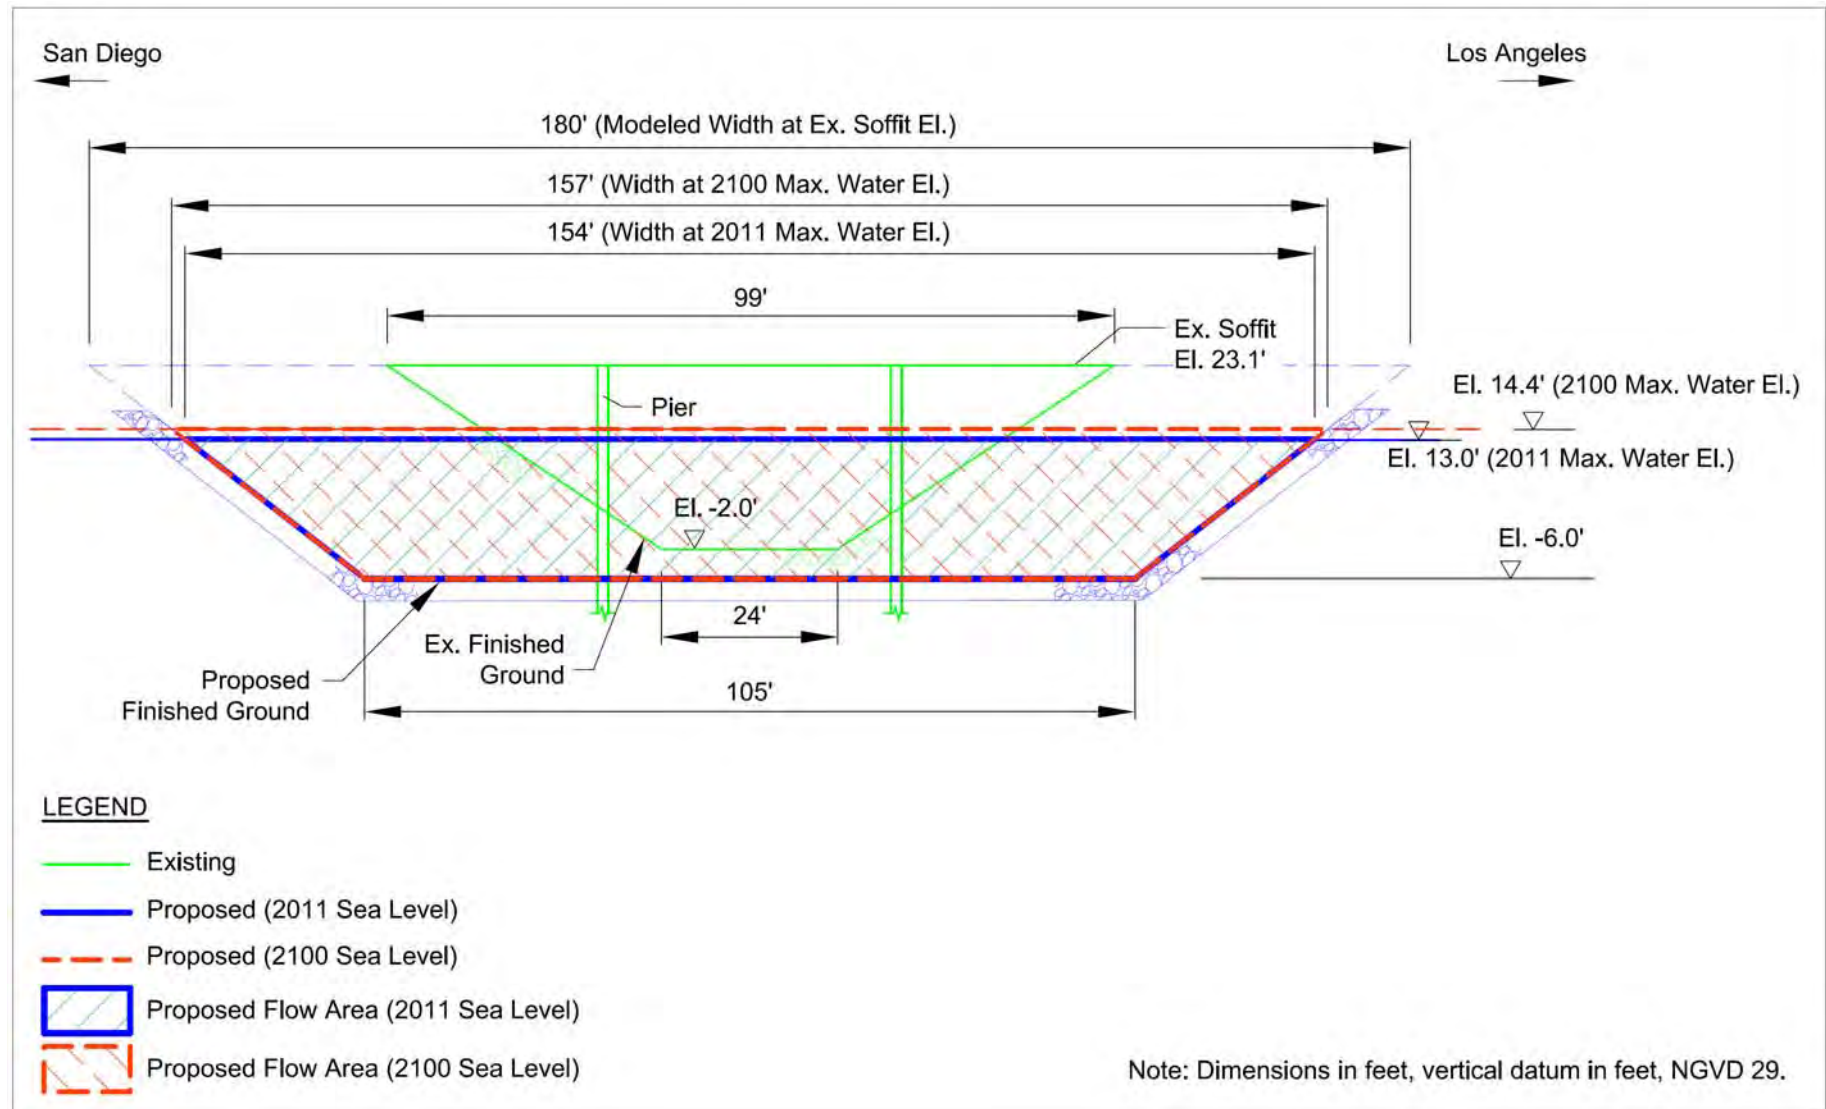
Desired Channel Cross Section of I-5 Bridge at Buena Vista Lagoon
